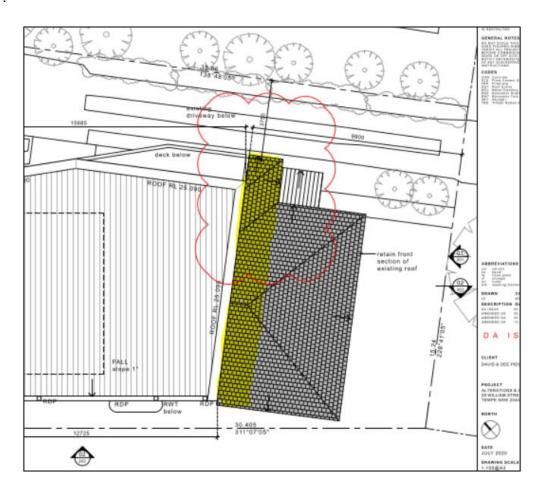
Proposed First Floor Setback – yellow highlighted shows increase in original roof form being retained as part of the amended plans submitted with the application for review.
